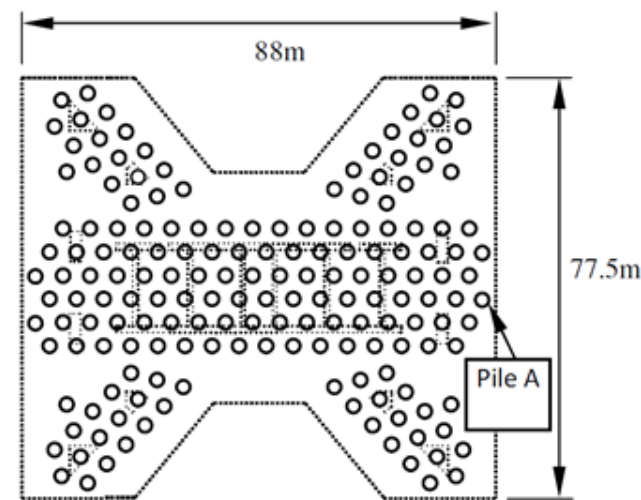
Plan view of piles arrangement (Poulos et al. 2011)
